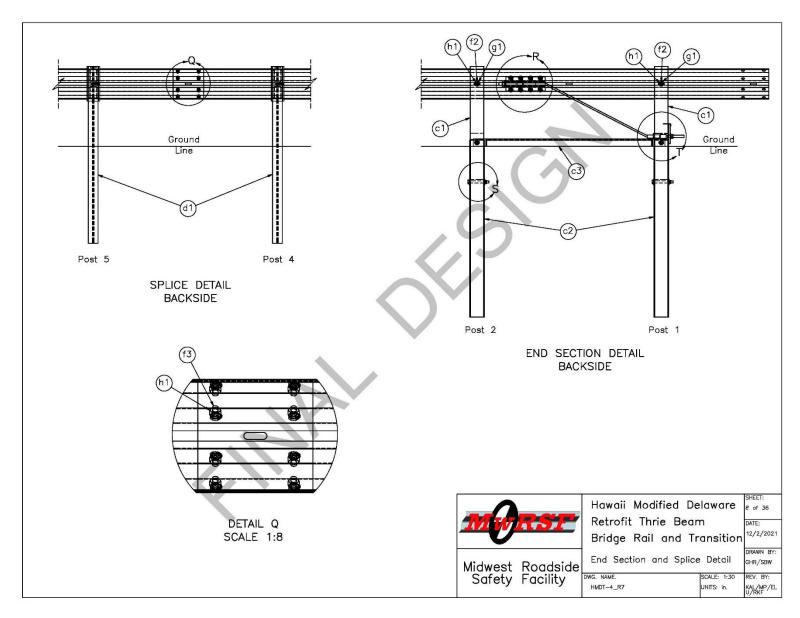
End Section and Splice Detail, Test No. HMDT-4
